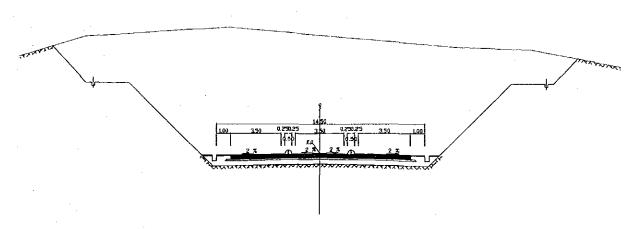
(3) Access Road - Cross Section of Excavated Area
